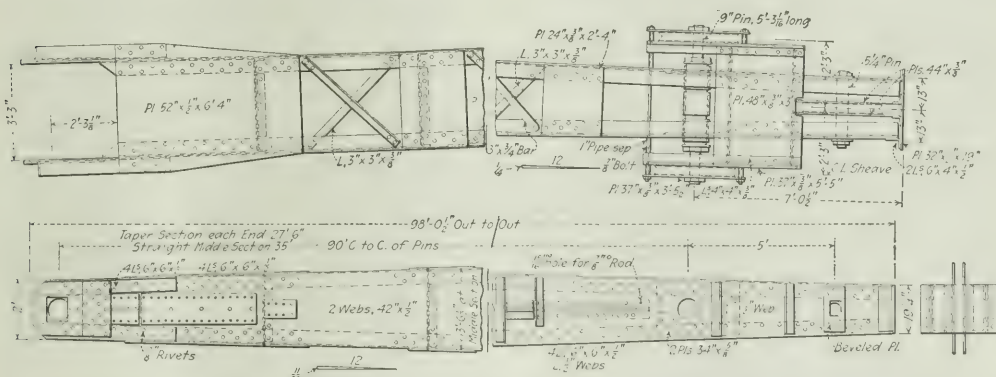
SPECIAL MAST BEARINGS AND BOOM DETAILS OF LARGE DERRICK
